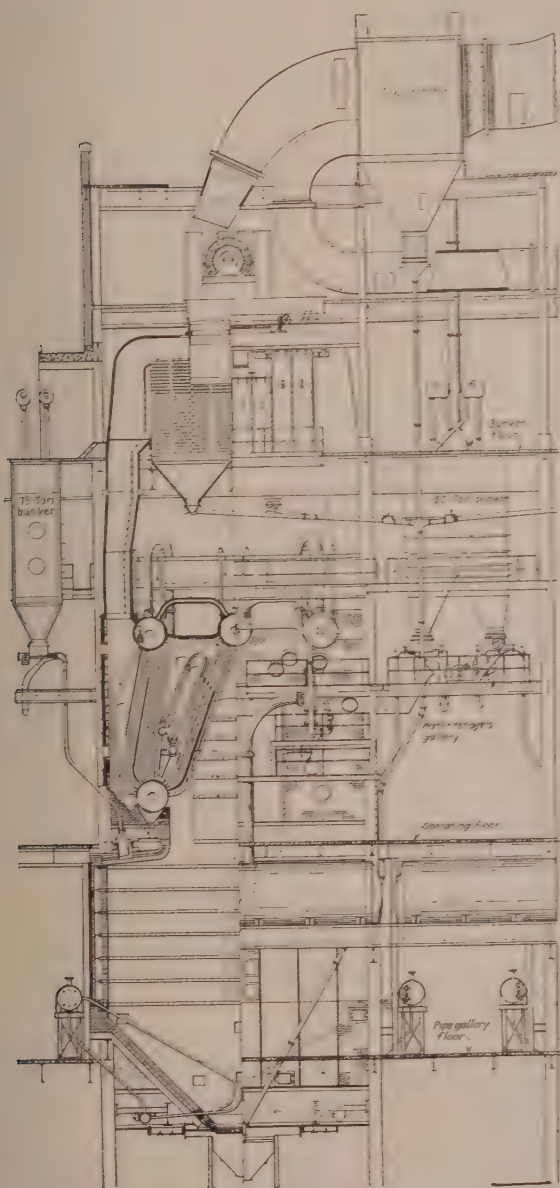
ELEVATION AND PART SECTION, ONE COMPLETE BOILER UNIT
